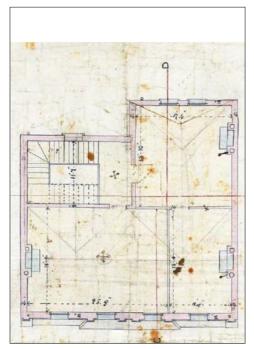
(left) 1873 first floor plan. source: Reproduced from the Portland House CMP.
